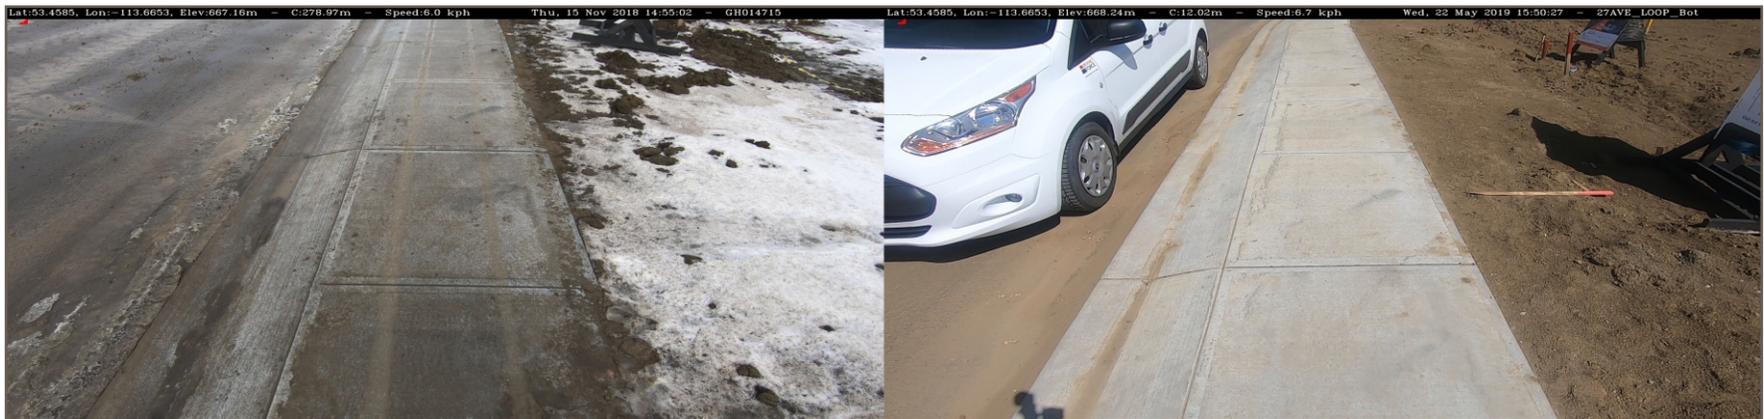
Uplands. 2018 photo on left, 2019 photo on right. Surface scuffing of the sidewalk near the back of curb is visible in spring 2019. Scuffing not present in fall 2018.
